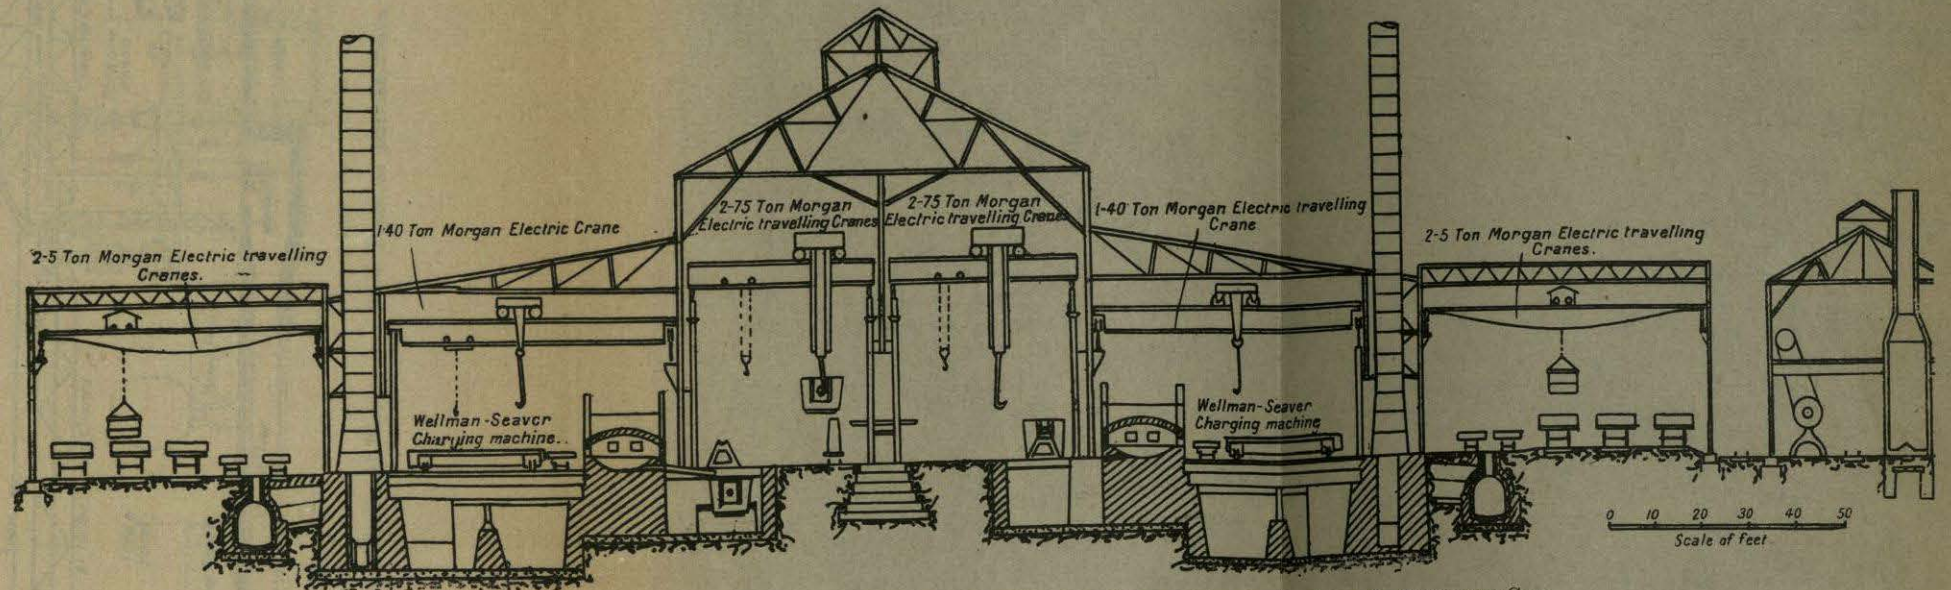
Transverse Section through Homestead Open Hearth Plant, showing Overhead Casting Cranes for Casting on Cars.
